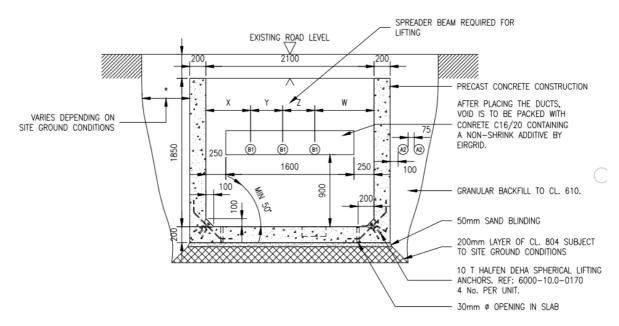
Cross-section of typical joint bay installation (Source: EirGrid XDC-CBL-STND-H-012 Sheet 002)
